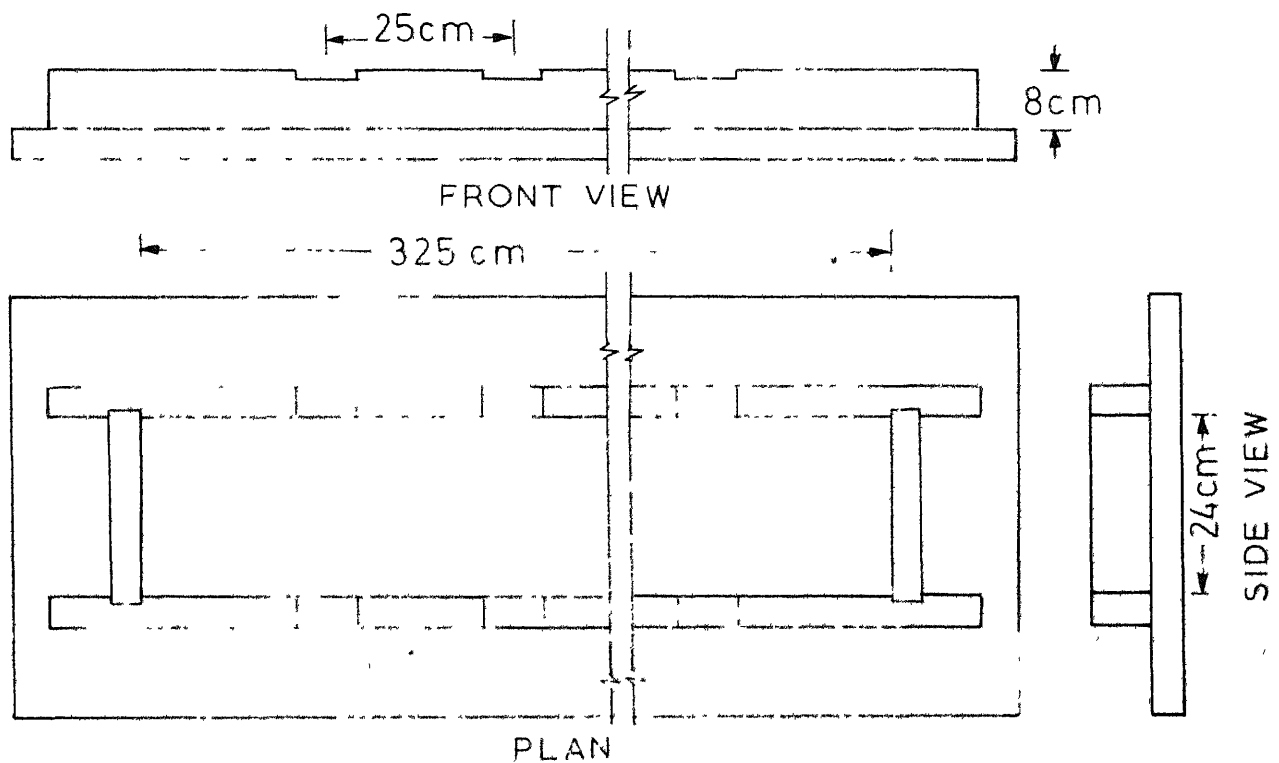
(b) Mould for casting R.C. beams (Tensile loading)
